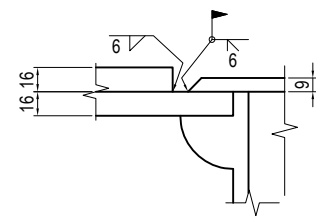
DETAIL OF MAIN GIRDER STANDARD (7) S=1:20
